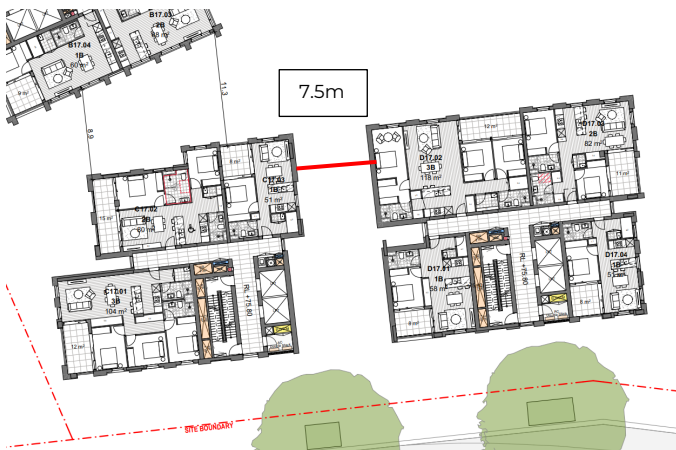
Building Separation Between Building 2.2 and Building 2.3
